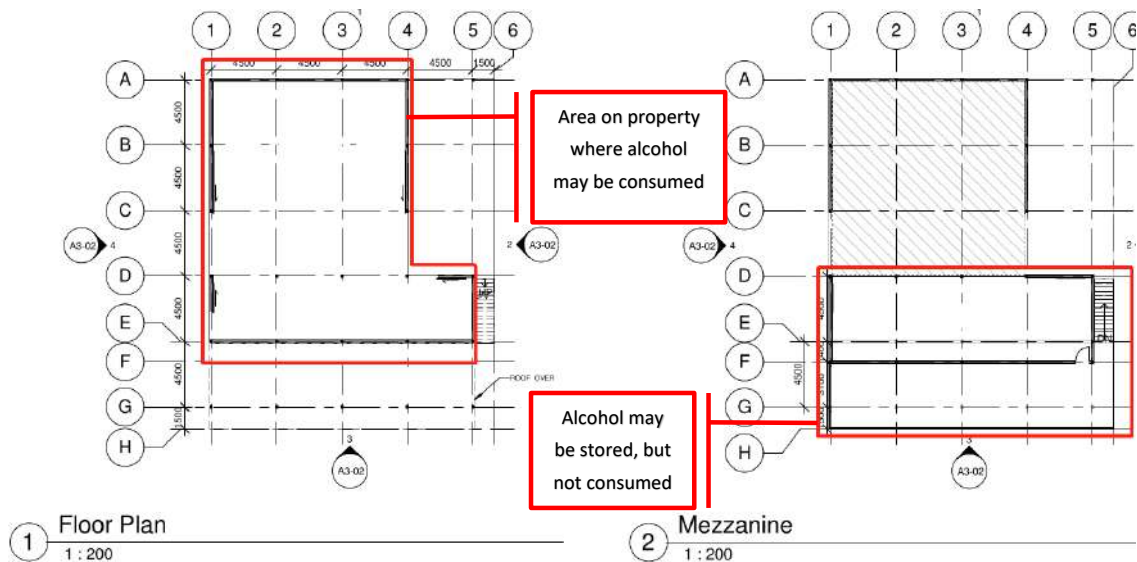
Extract of floor plans to show where alcohol may be consumed and stored
